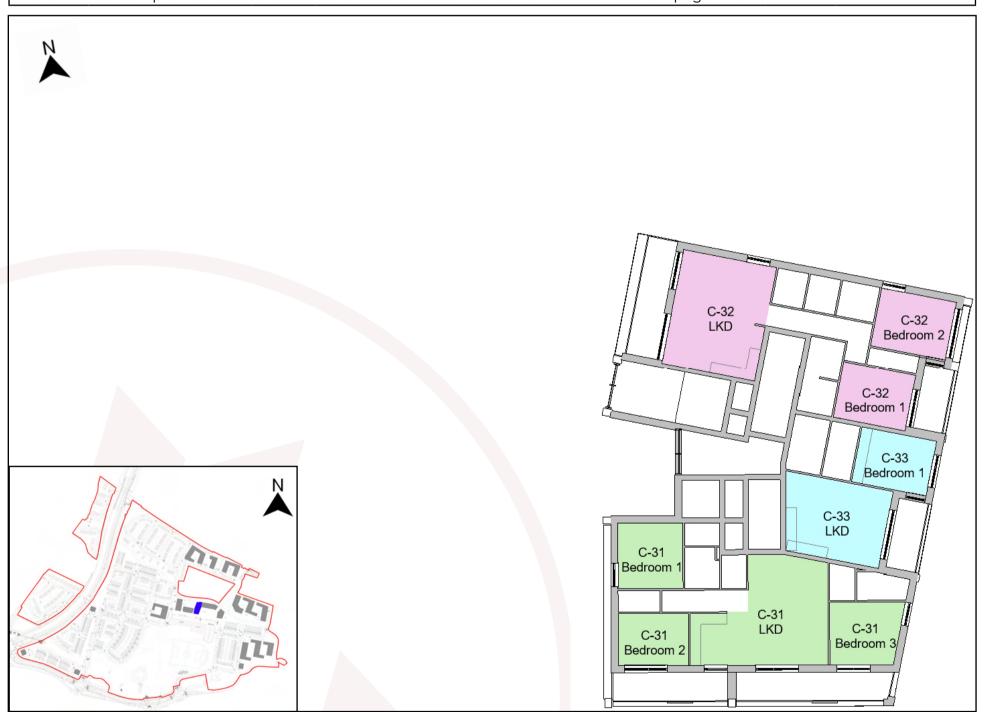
Keyplan highlighting the assessed building (L), Floor plan of assessed building (R).
